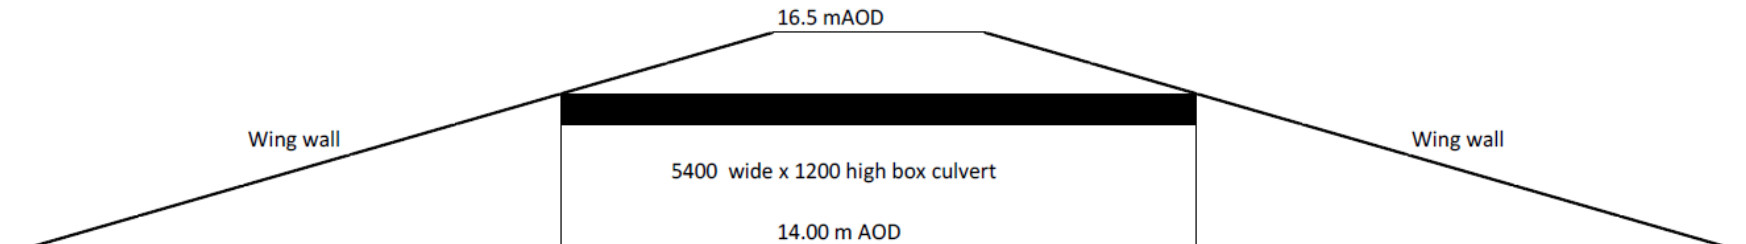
Proposed revised layout at crossing SW3 (Hawthorn Road).
